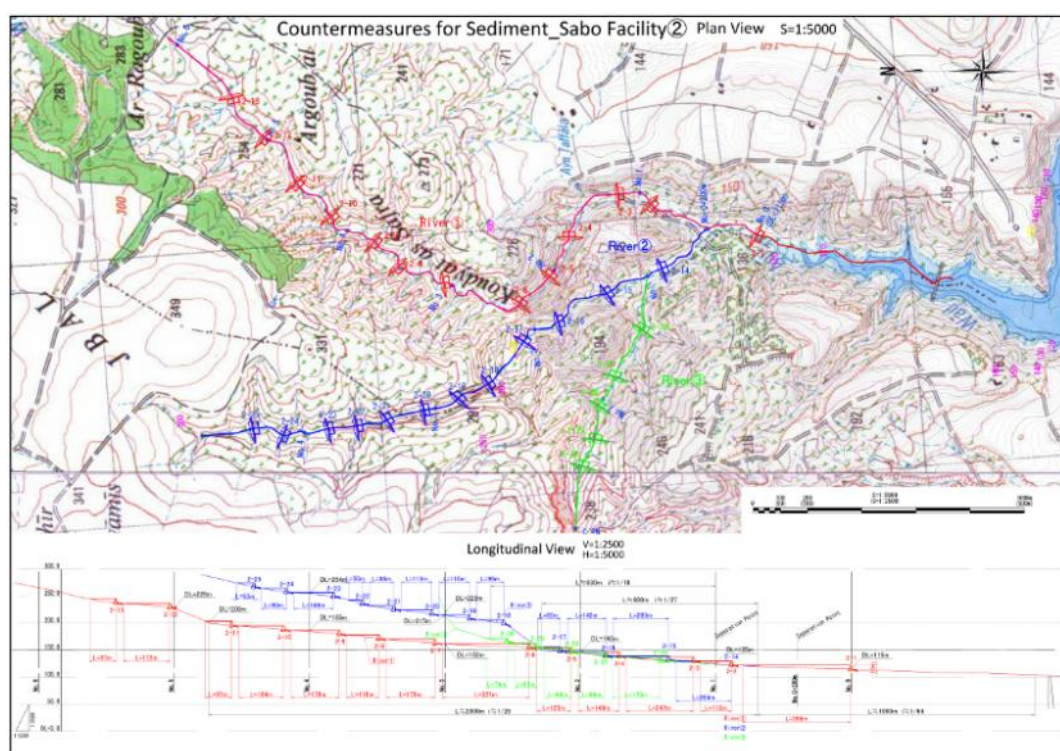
Sabo Facilities Layout Plan (2) Wad Koudyat as Safra River
